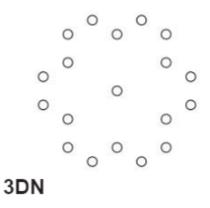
Sketch showing the 3-dimensional joints ¹⁴⁰
